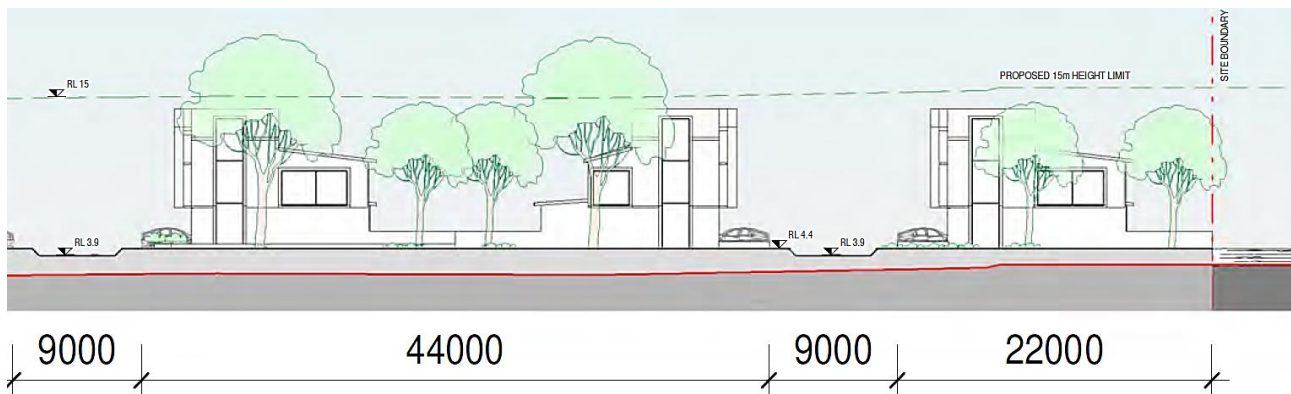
Elevation to Boondah Rd, north end of site next to Meriton complex (extract Buchan Group report)
